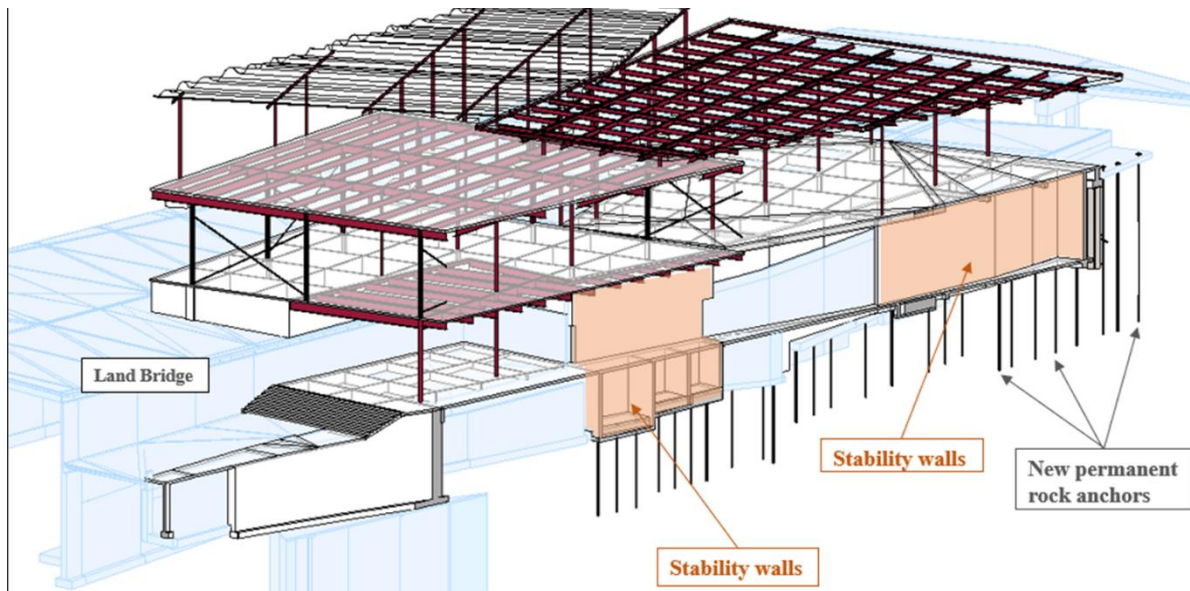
3D view from Arup structural Revit model, showing portion new structure built over land bridge (blue), connecting to stability walls (orange) founded on rock off land bridge.
